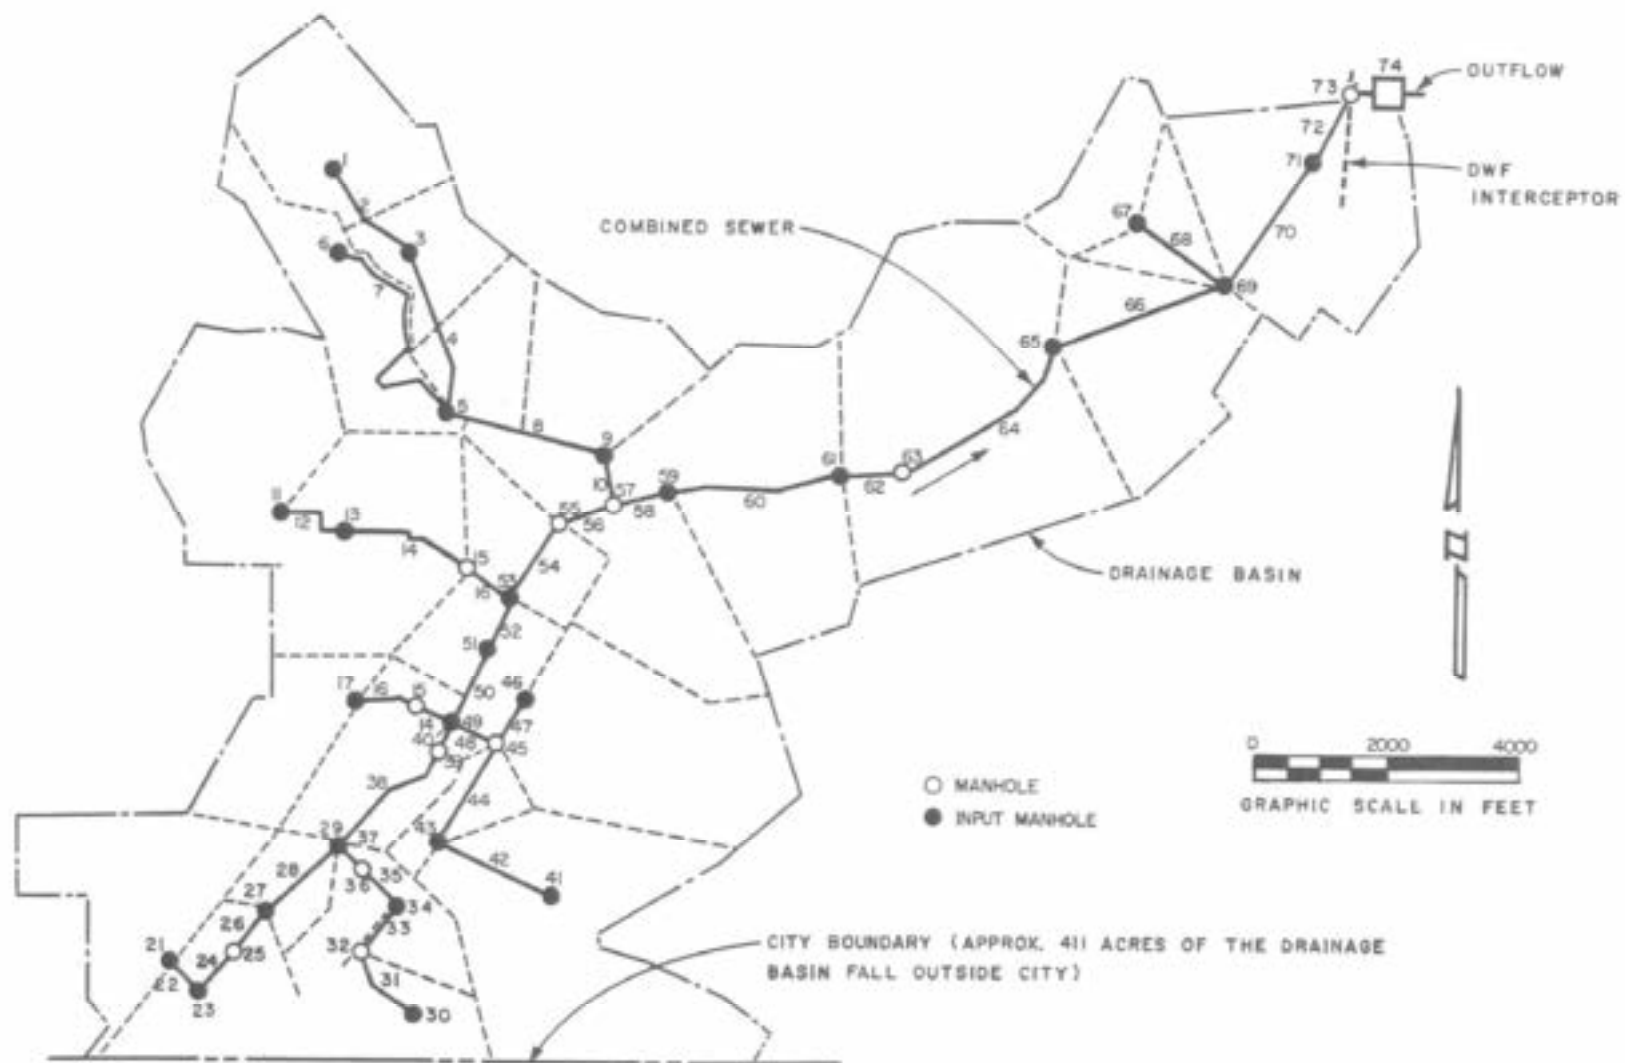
PLAN OF SELBY STREET SYSTEM
